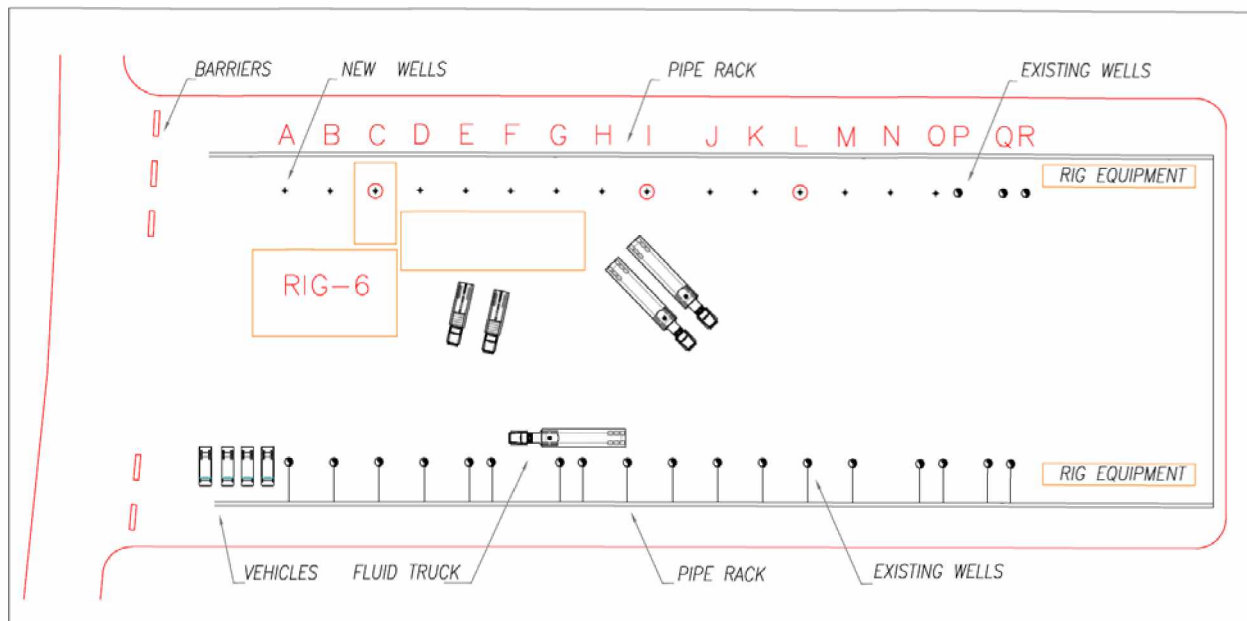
Typical Alaska's North Slope Drill-site – Scenario No 1
